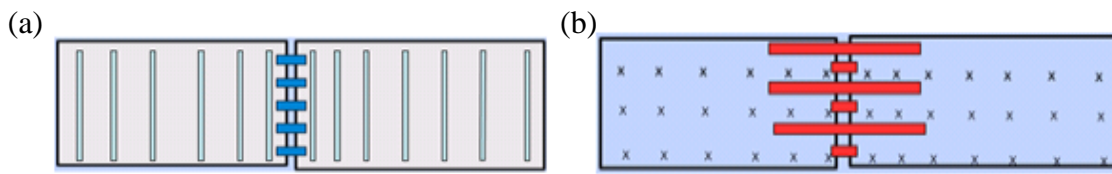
Connection of Adjacent Walls with; (a) Lattice Girder, (b) Wave System
